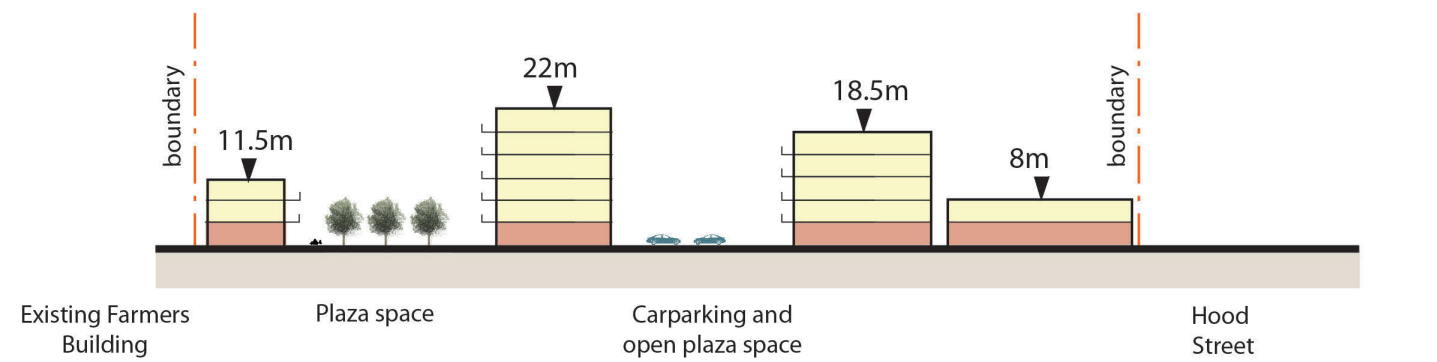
Indicative concept section A-A for Development Site 2 (not to scale)
